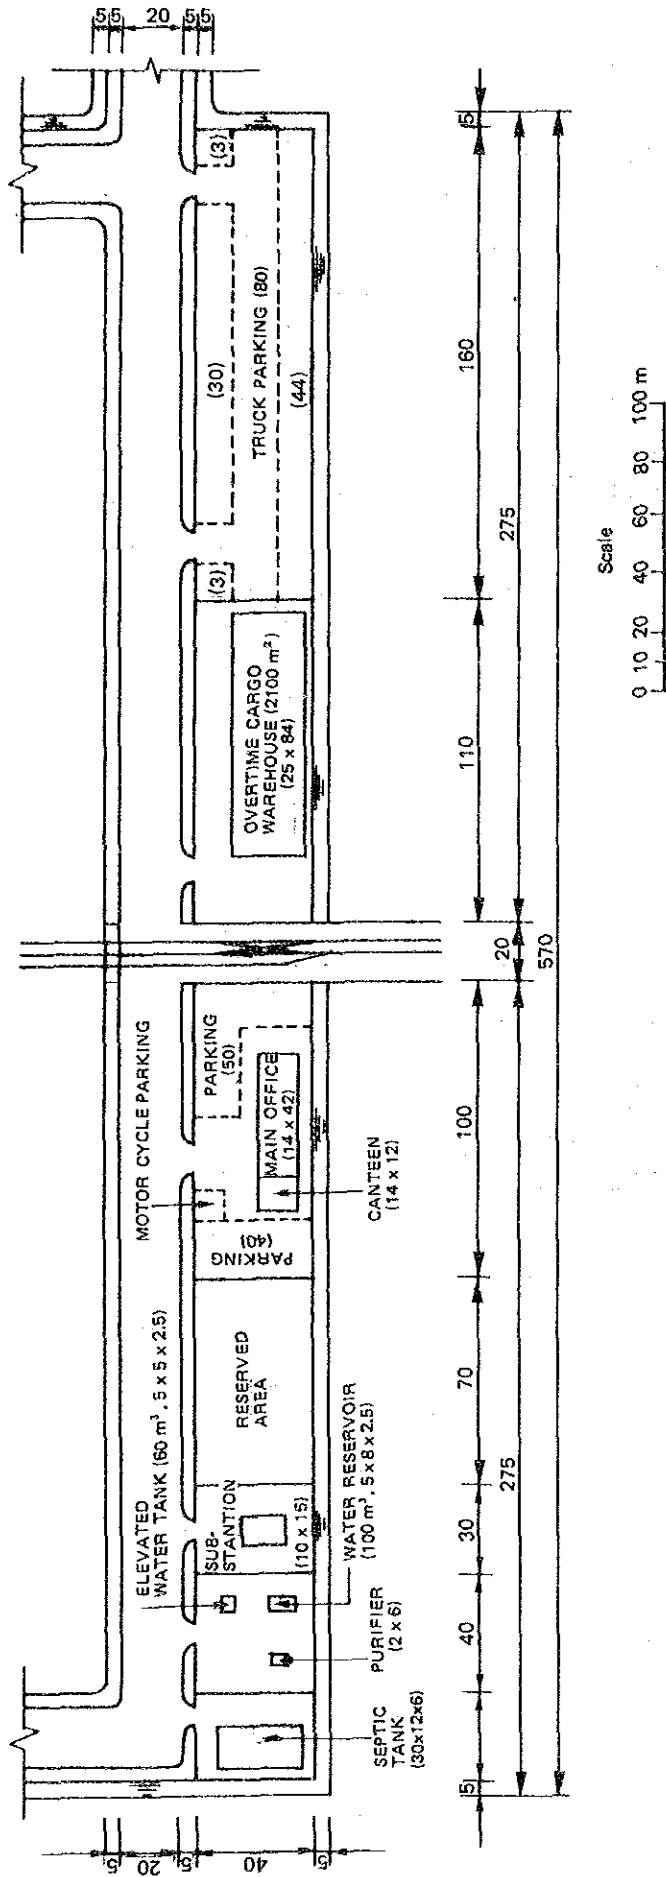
Layout of the Administration Zone at the Lat. Krabang Inland Container Depot (First stage Plan)
